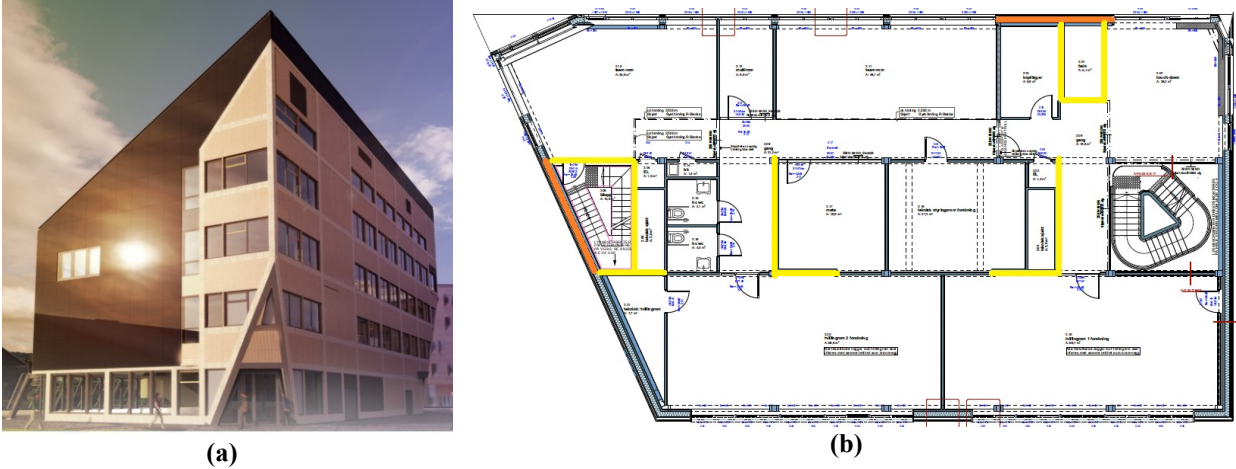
(a) Illustration of the ZEB Laboratory and (b) plan drawing of second floor showing external CLT-based walls illustrated in orange and internal CLT-based walls in yellow. Source: [8]
